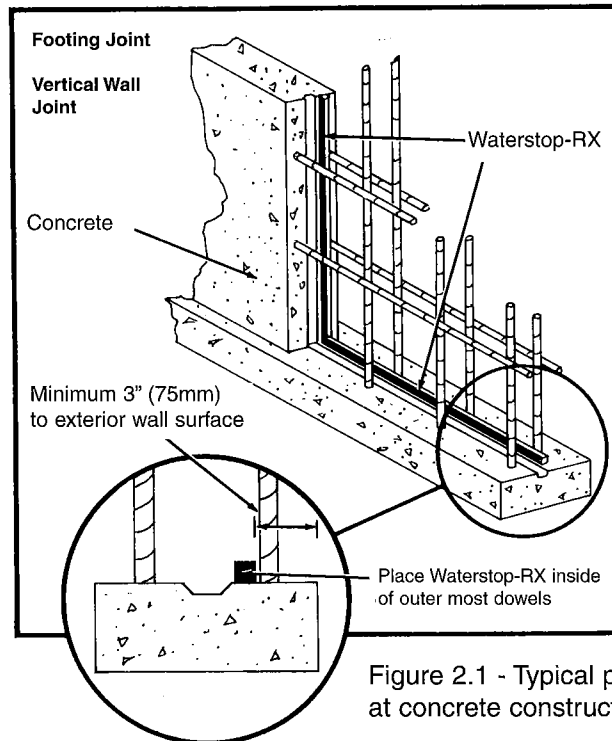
Typical placement of Waterstop-RX at concrete construction joint
